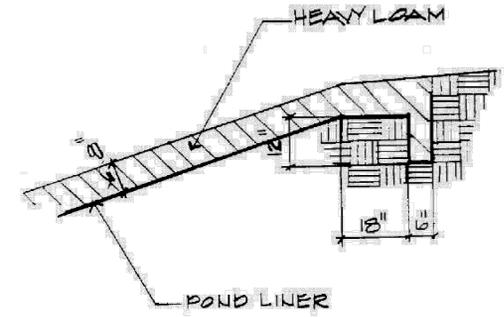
Example of Liner Installation on Earthen Slope (Courtesy COA)
